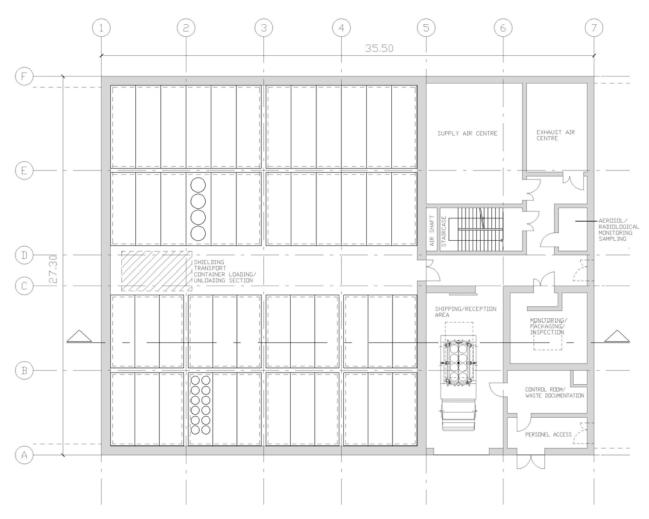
GROUND FLOOR LAYOUT OF ISF
